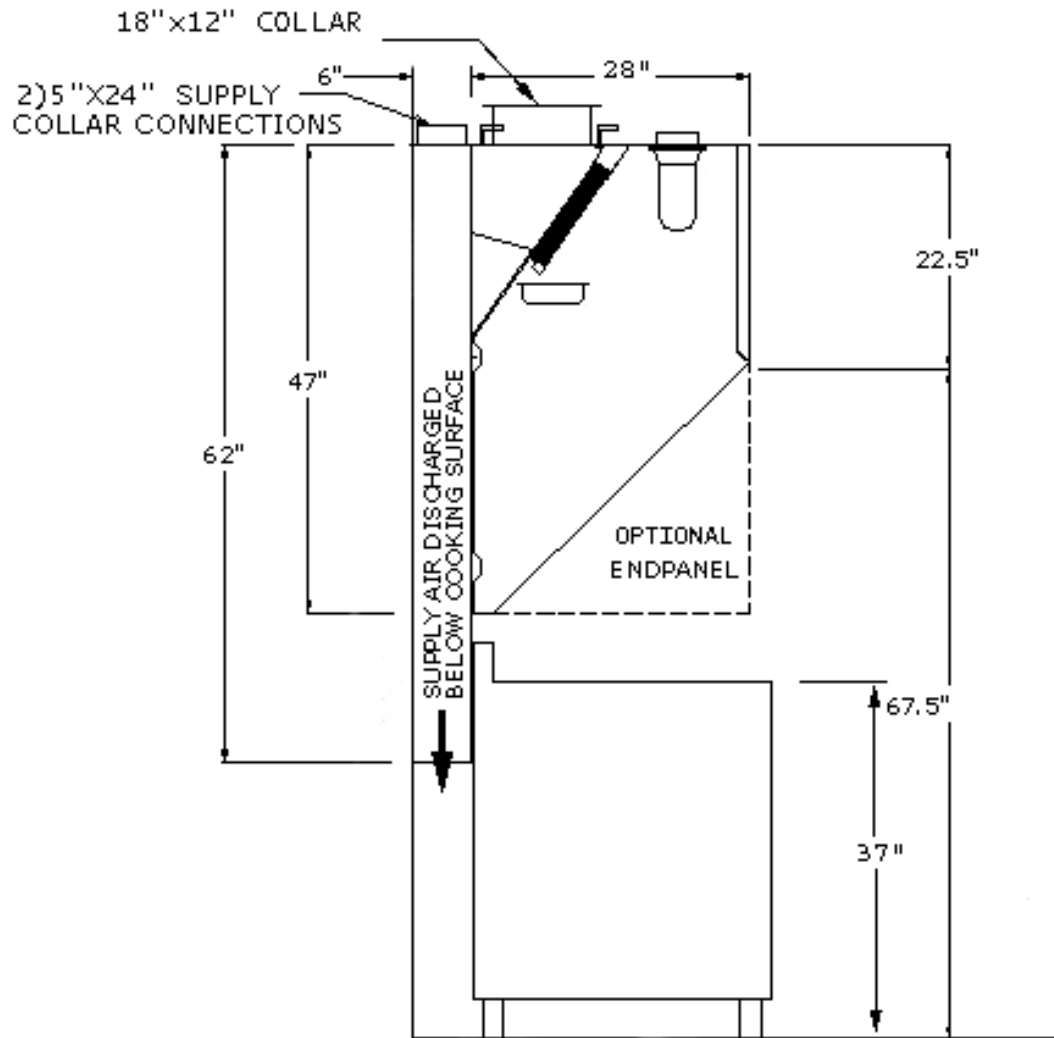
Cross-Sectional Drawing of the Wall Mounted Backwall Supply Proximity Hood
